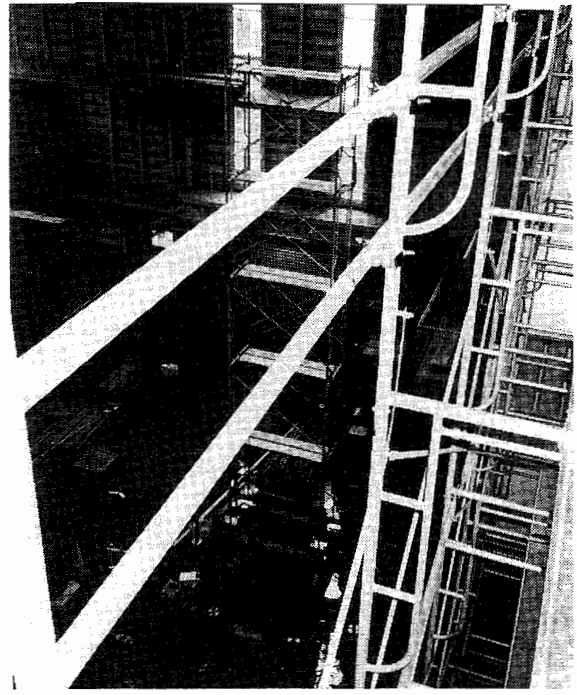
Handrail (two pipes at height of 90 & 45 cm).
